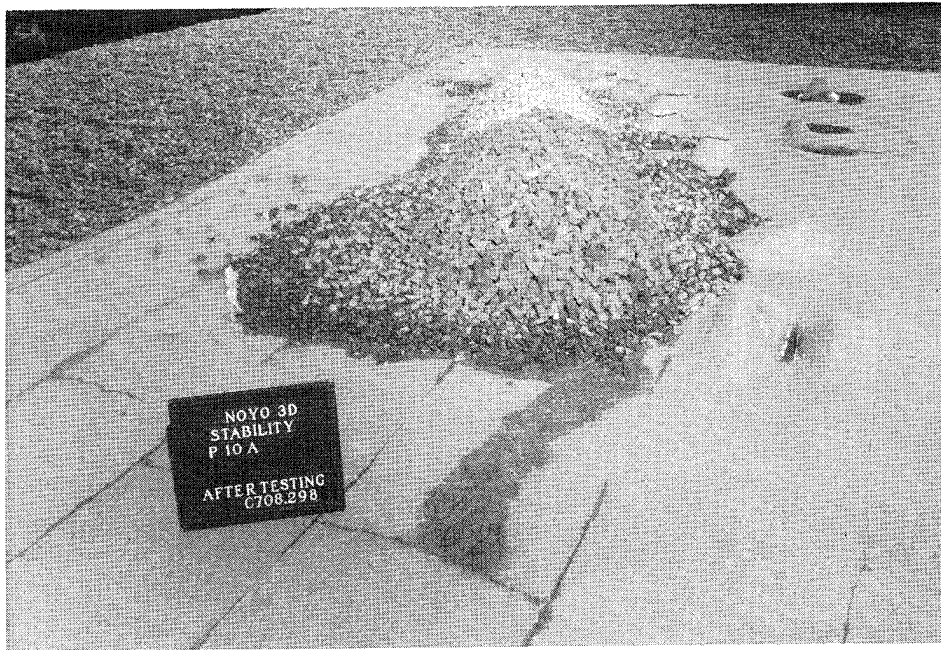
Plan 10, north roundhead after two series of Storm IA waves
